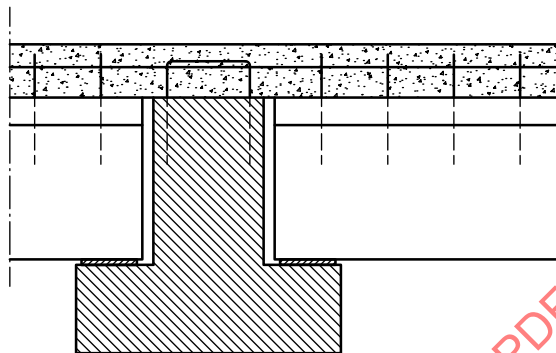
Hybrid connection: floor ribbed elements to a supporting beam
